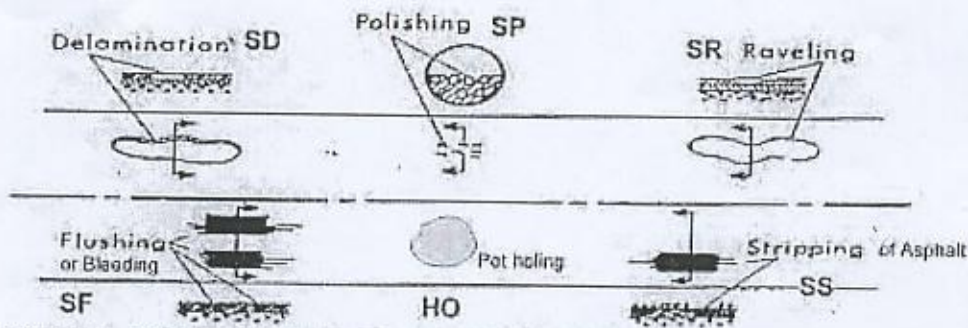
SURFACE DISTRESS OF FLEXIBLE PAVEMENTS
